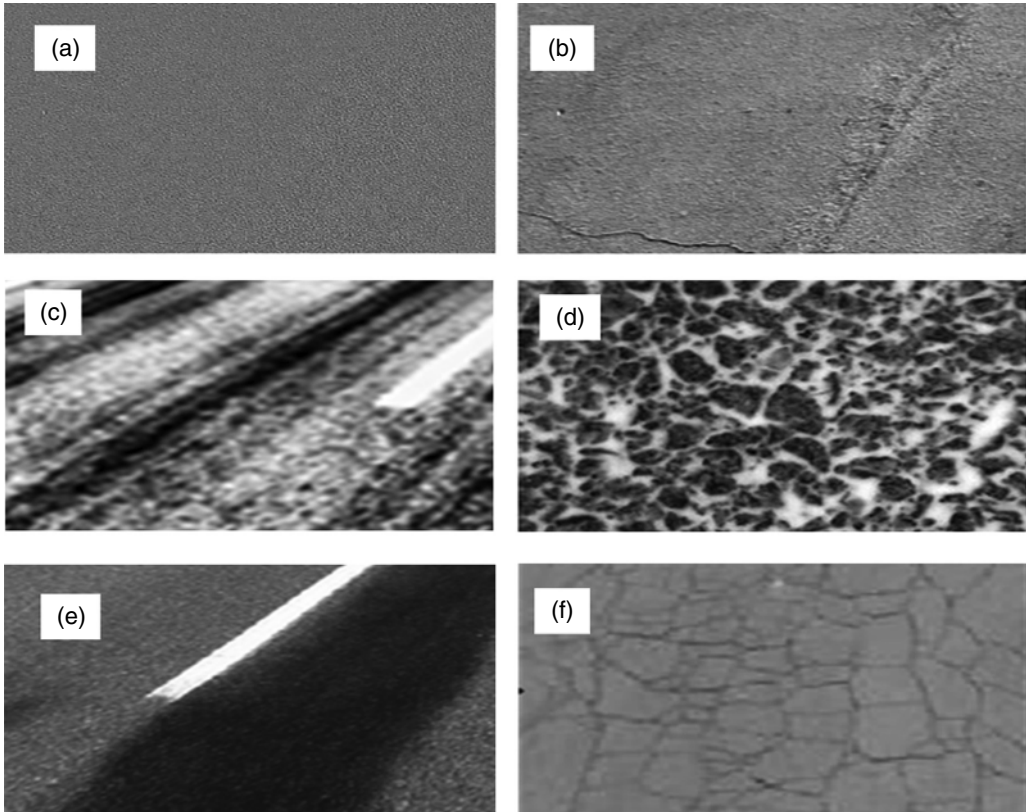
Examples of 2D images as an input for the processing step. (a) Pavement without surface damage with coarse texture, (b) pavement with small transverse cracks, (c) pavement with bitumen damage in the path of wheels, (d) pavement with high surface drainage capability, (e) pavement with rutting distress in wheel path, and (f) pavement with alligator-type surface cracking distress (fatigue cracking).
